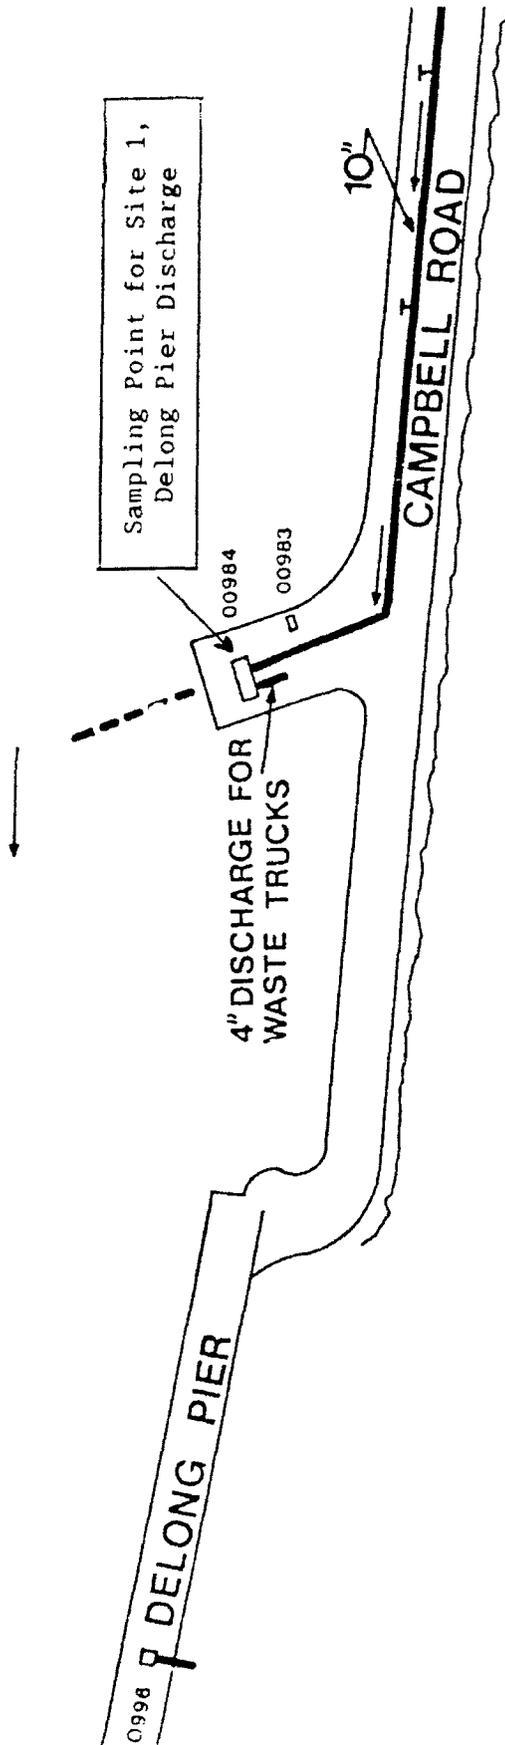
Blowup of Thule AB Sewage System Map Showing Location of Site 1, Delong Pier Outfall.
